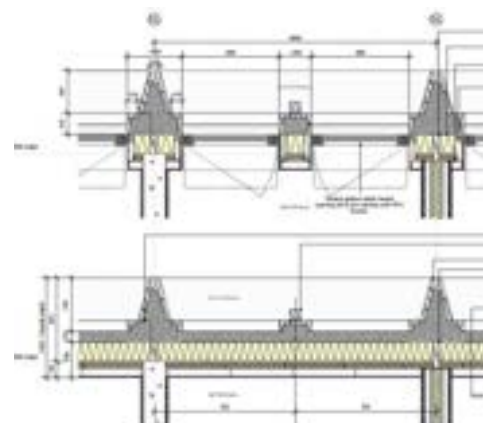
Section and plan details showing top: Typical window bay; and bottom: Typical solid wall bay
